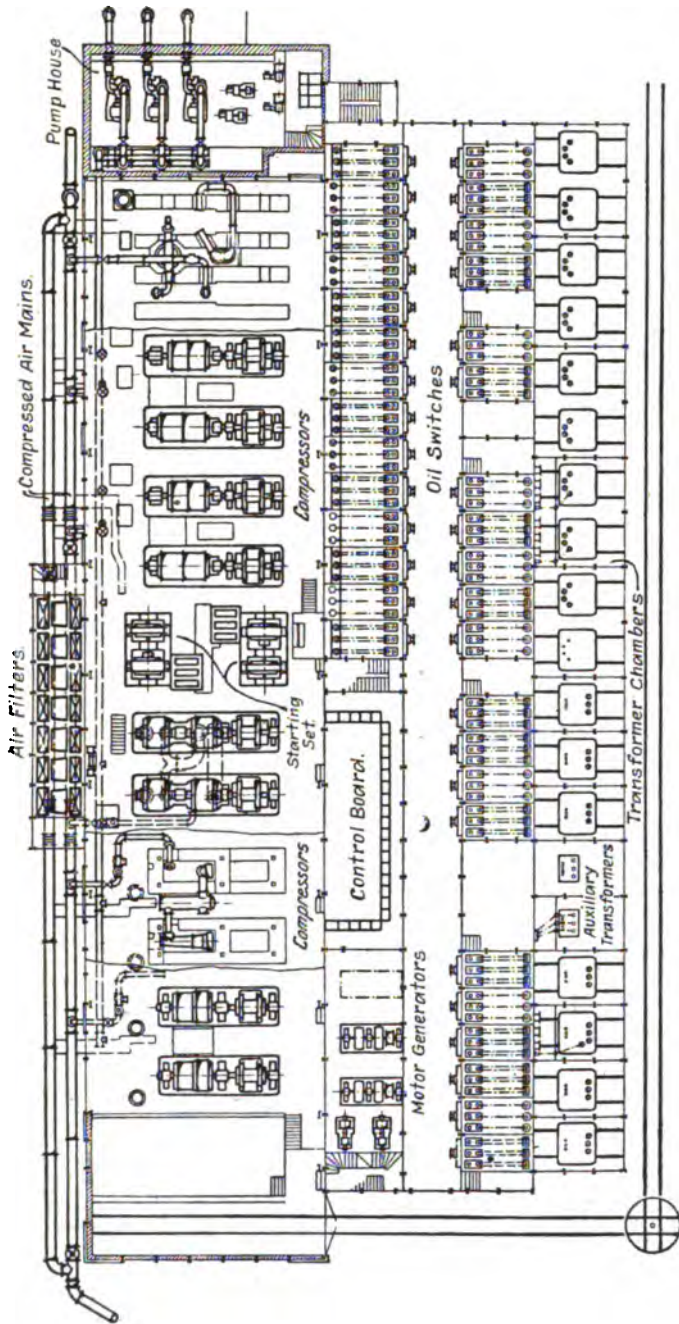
Robinson Central Station. Plan of the Switch House and Engine Room.
